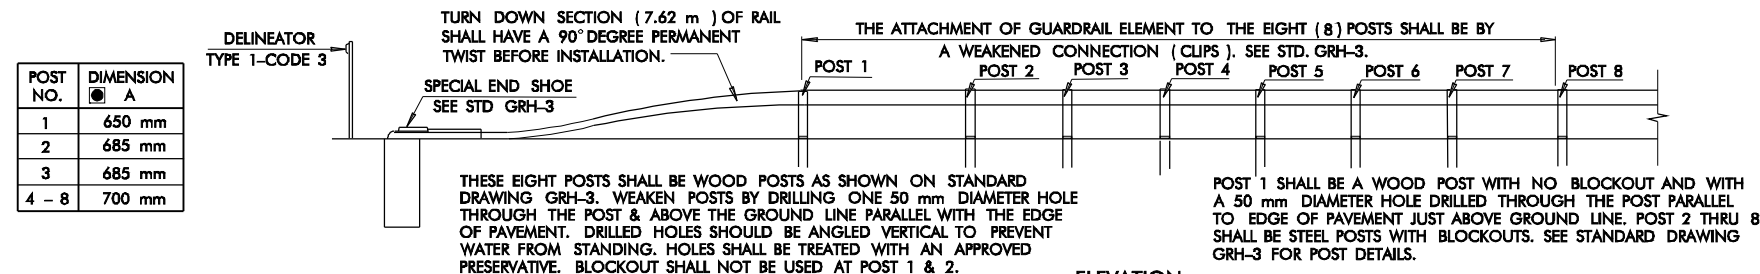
DETAIL OF GUARDRAIL POST IN SHOULDER BASE WIDENING
